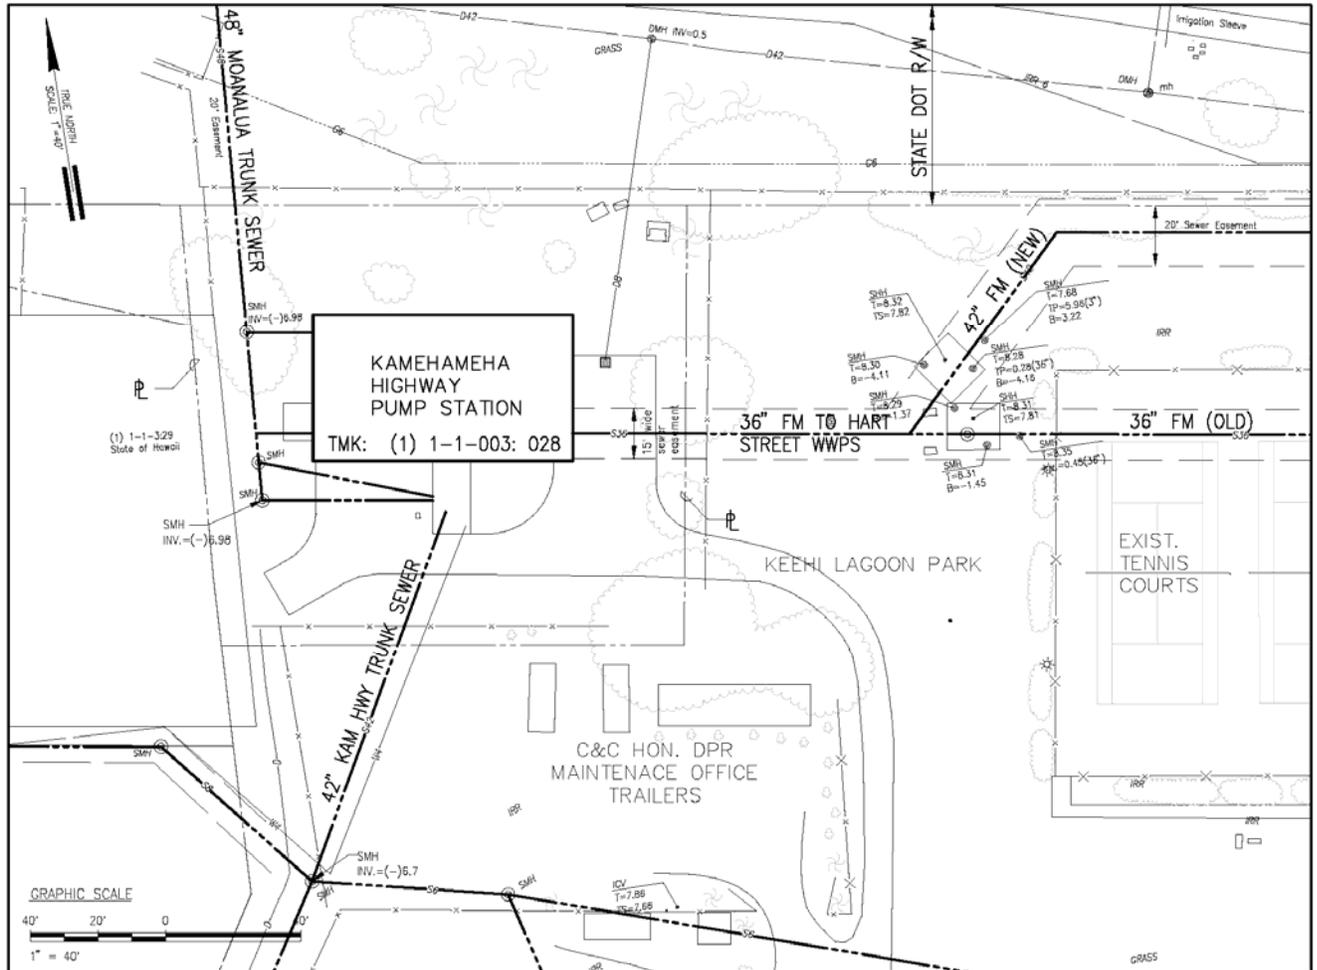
Existing Kamehameha Highway PS Site Plan
